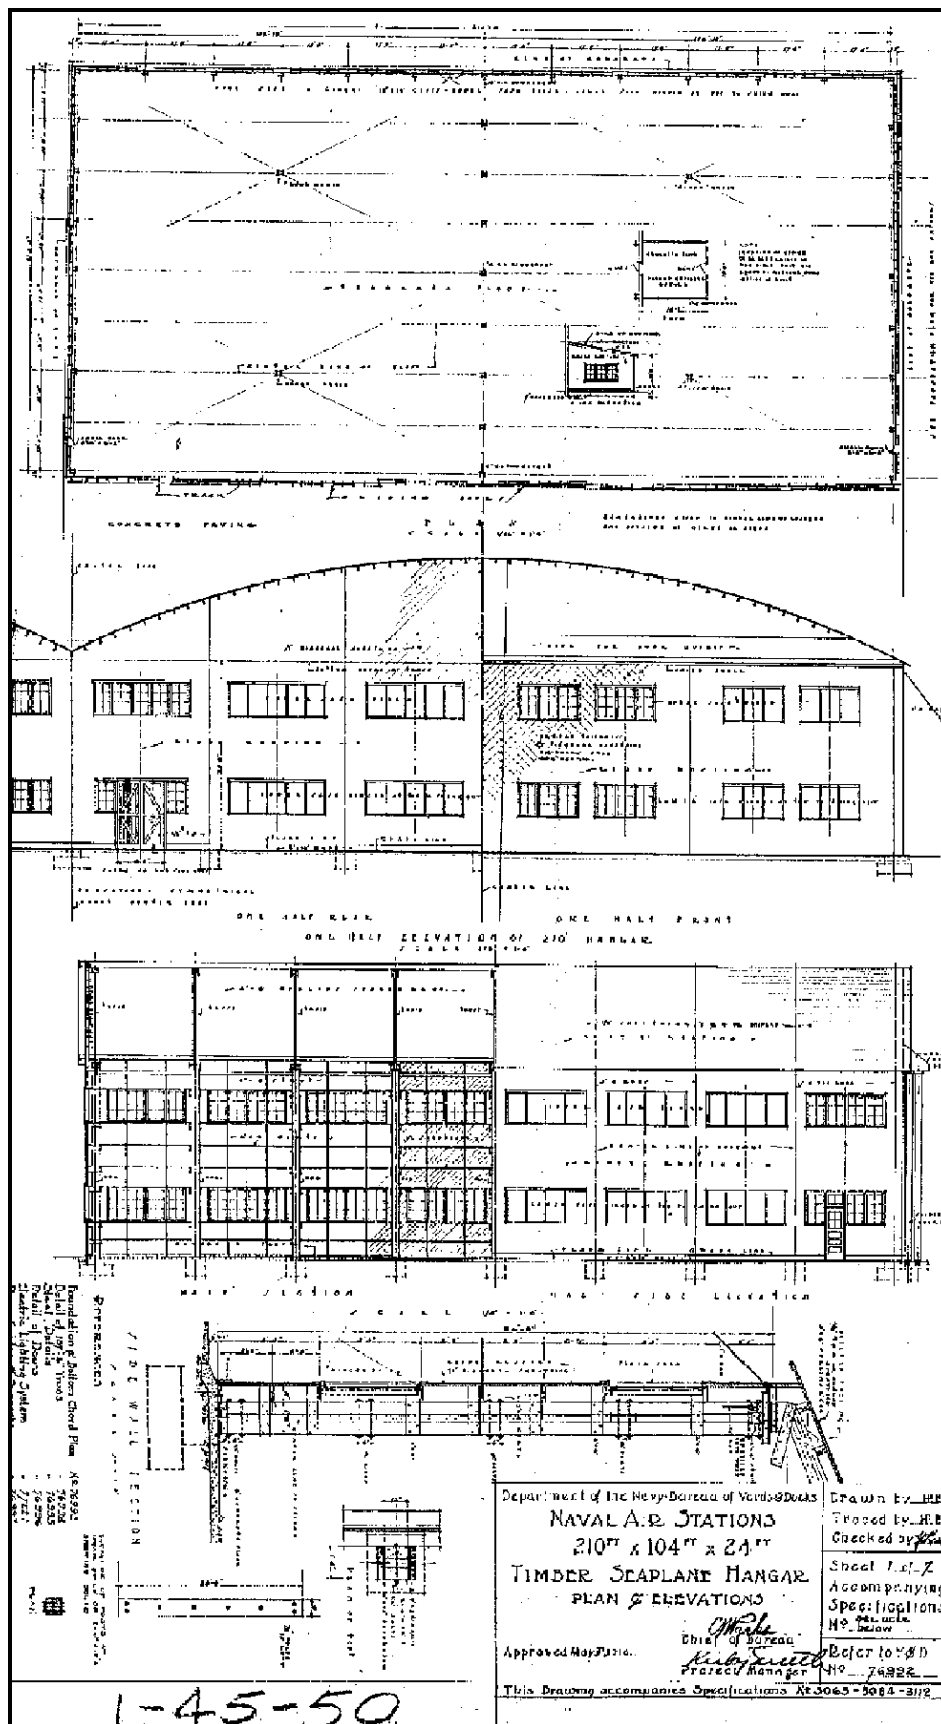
Plan for the 210 x 104 x 24 Foot Timber Seaplane Hangar.
